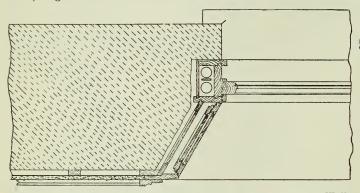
Horizontal Section through Window Opening in Stone Wall.
